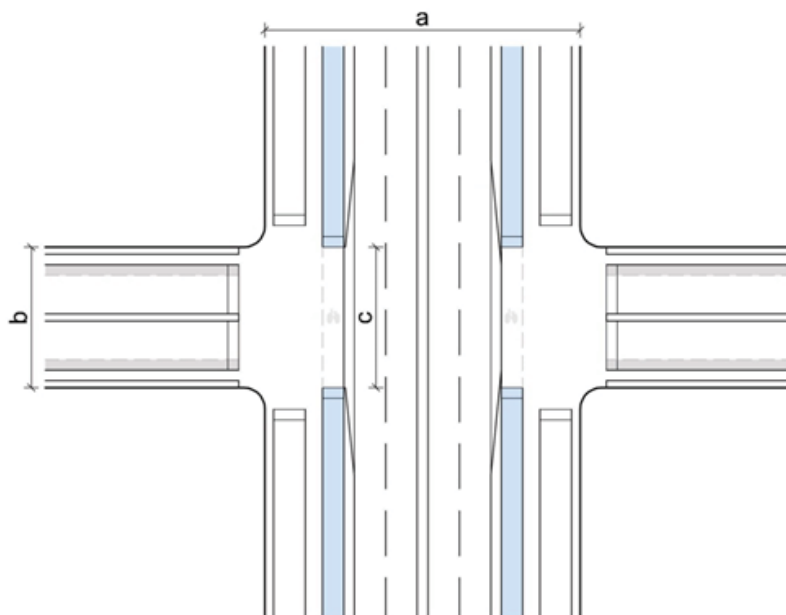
Cross section –access road plan and section - distributory road without parking areas (RoW 12 -30m, Design speed 30km/hr)
